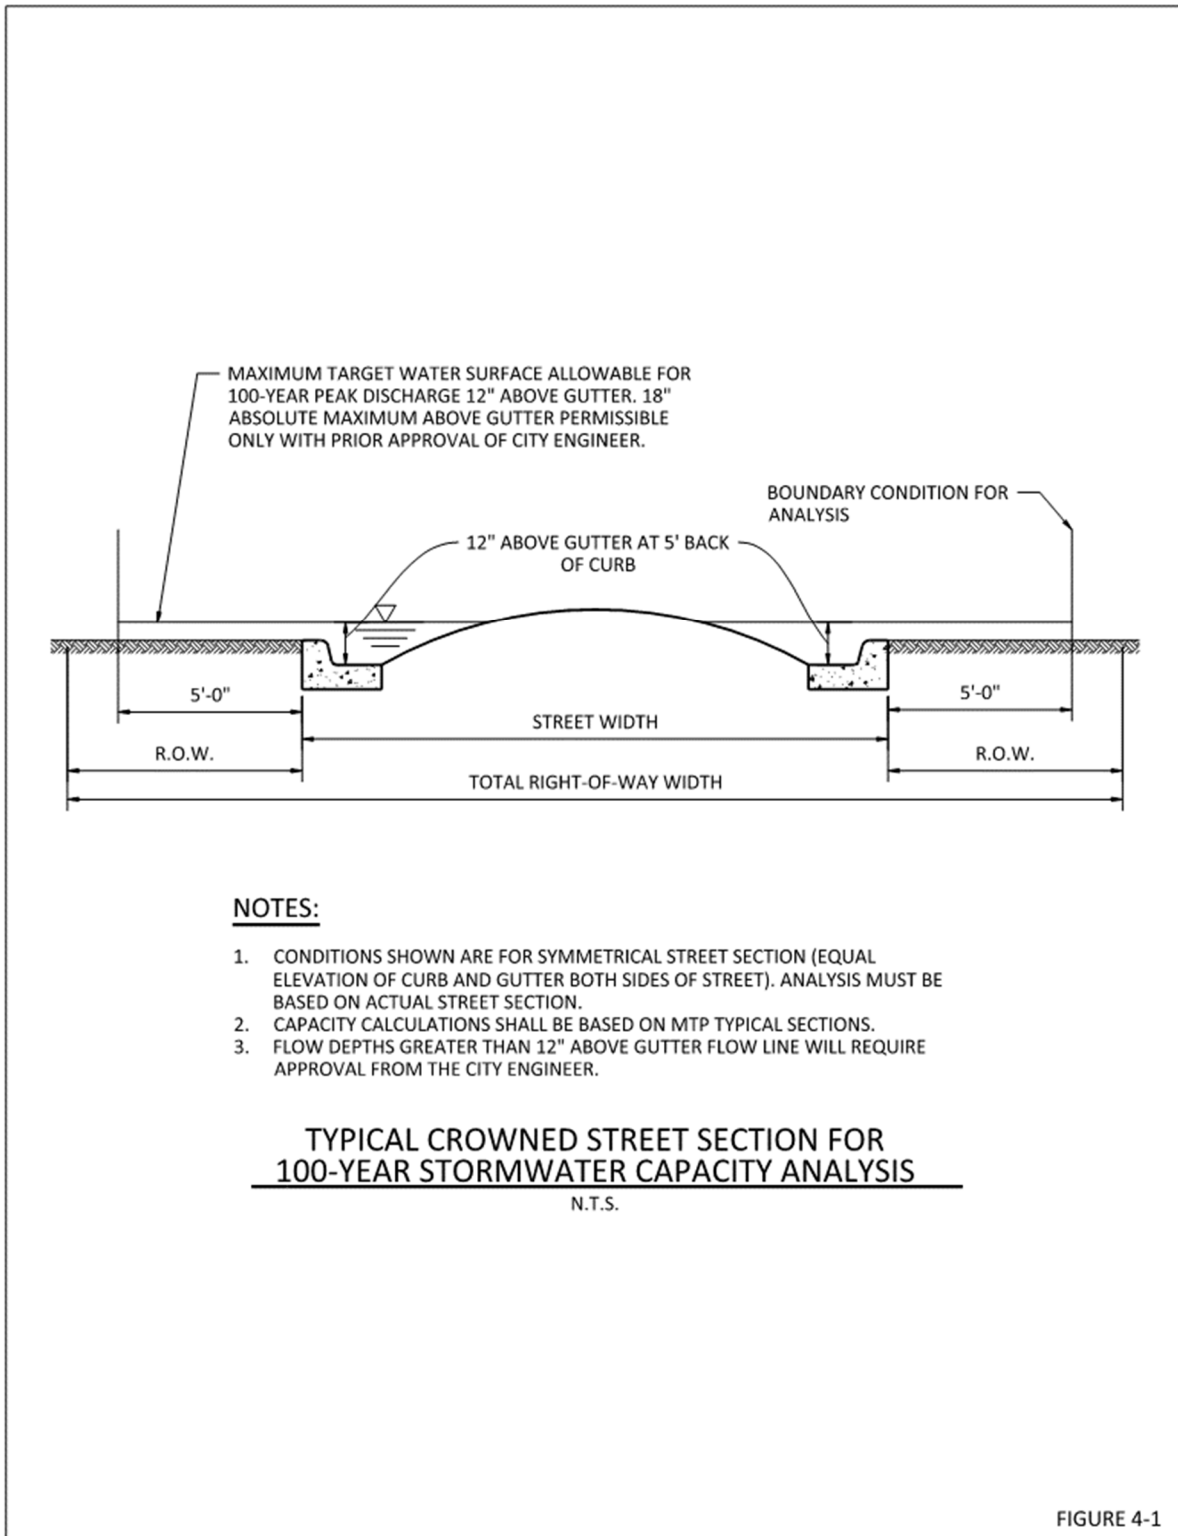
Typical Crowned Street Section for 100-Year Stormwater Capacity Analysis
